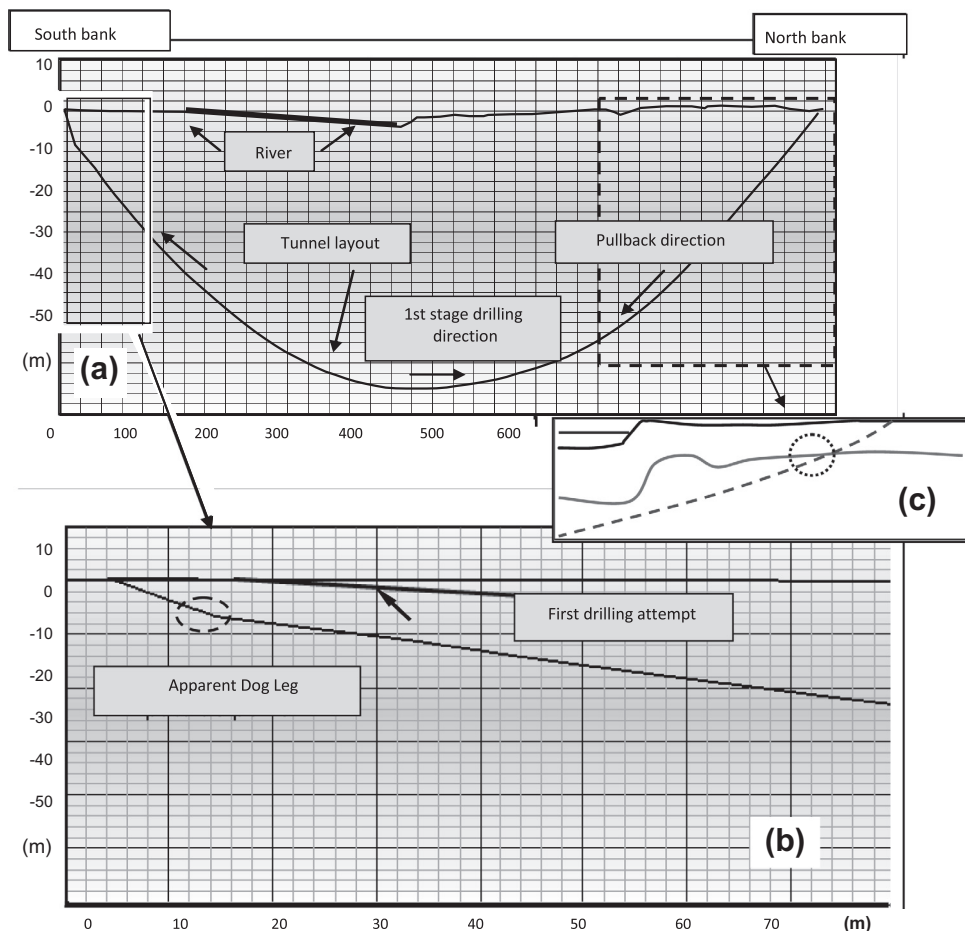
(a) Sketch in elevation of the HDD tunnel under the river (scales in m), (b) detail at south bank, (c) detail at north bank.
